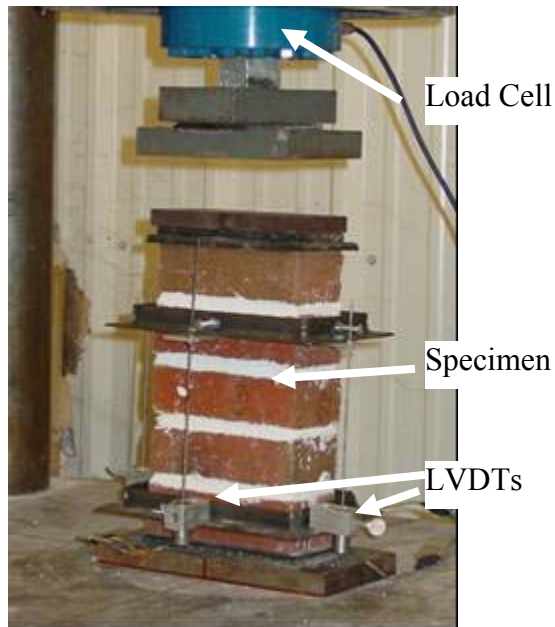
Test setup for the measurement of elastic modulus of masonry (5 brick specimen)
